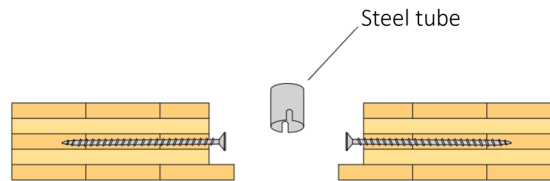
In-plane W2W joint: Bonding steel tube. (Swedish Wood, 2019).
